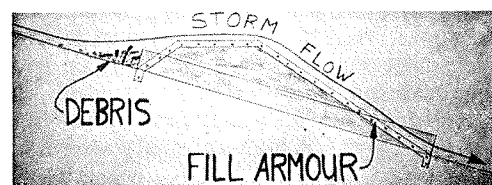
High water ford to prevent washing out of road when debris plugs culvert.
